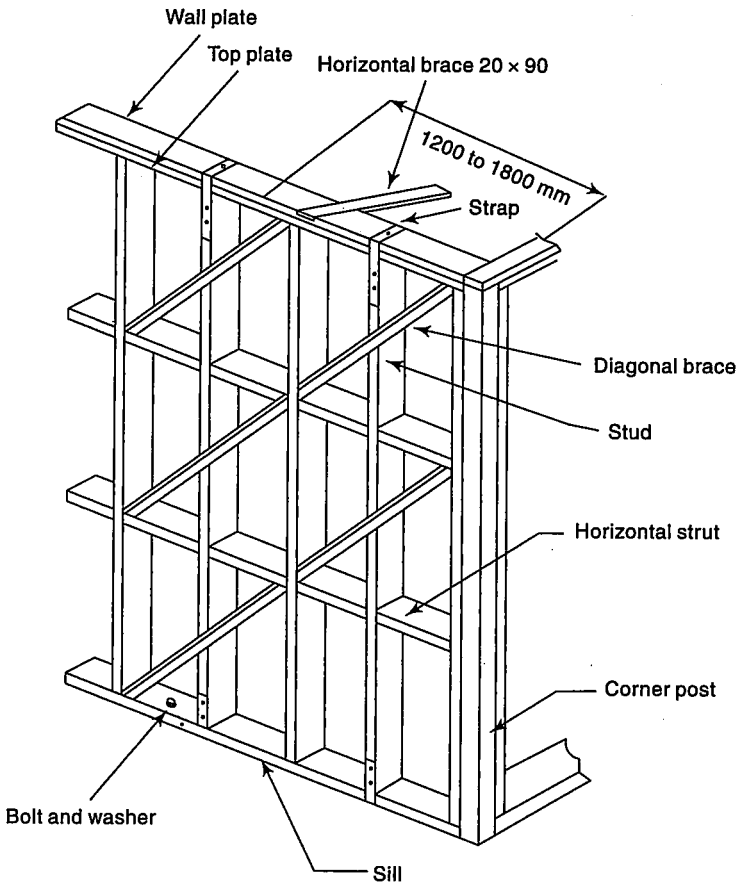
Timber framing in stud wall construction without opening in wall
